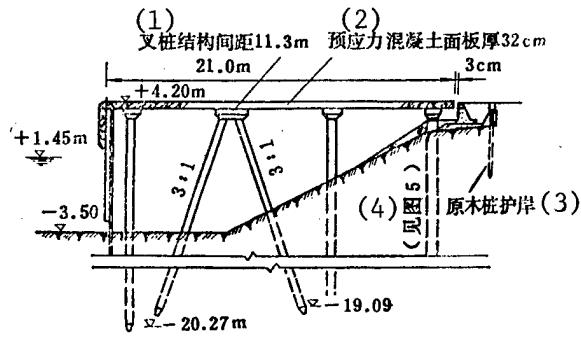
Cross-section illustration of pile-elevated docks of river harbors (Yujiabao foreign trade dock)
